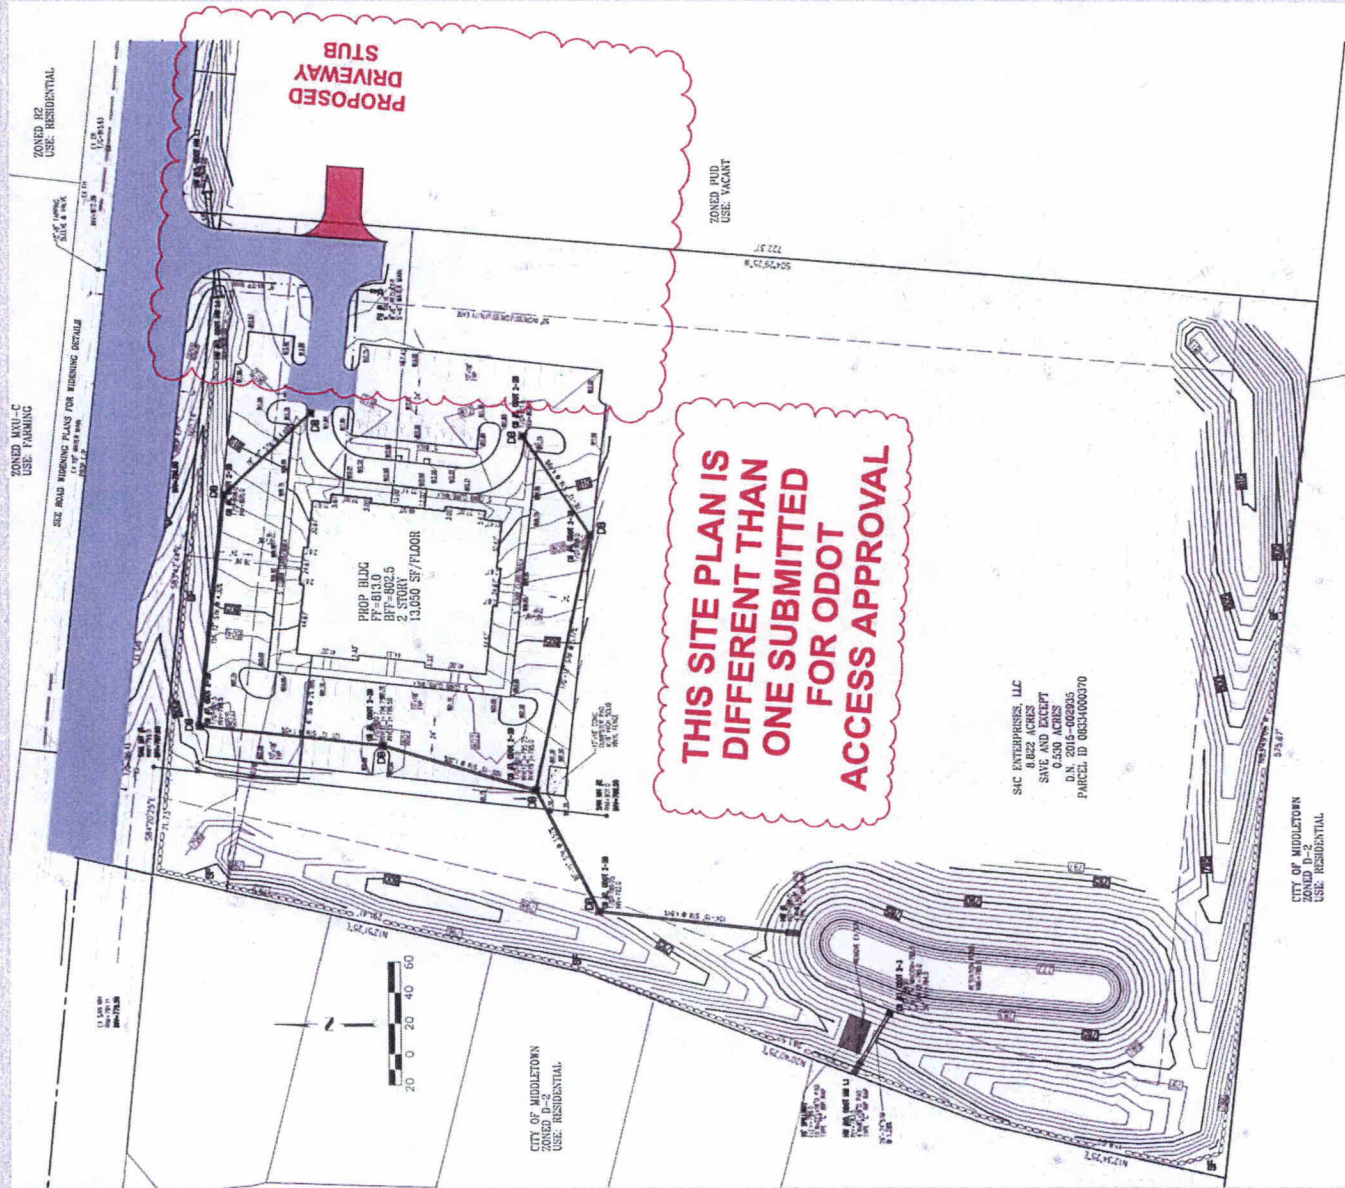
Exhibit A: Proposed B1 PUD Zoning Stage 2 Preliminary Site Plan
